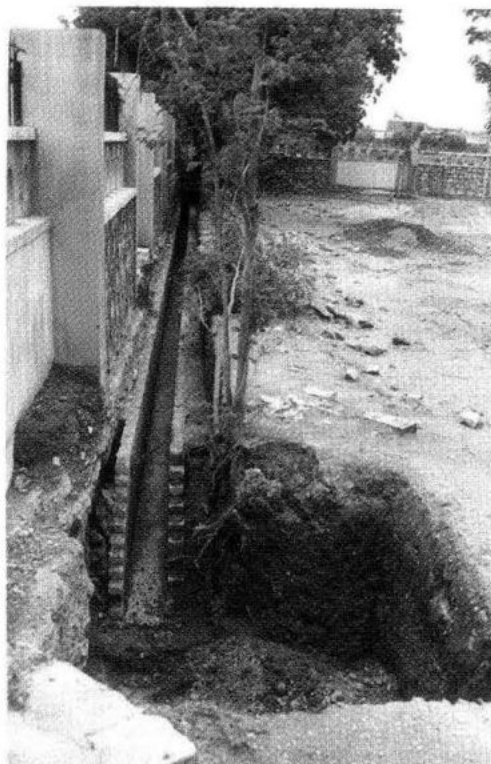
Roof-water drain leading to collection pit adjoining a dug-up well.
